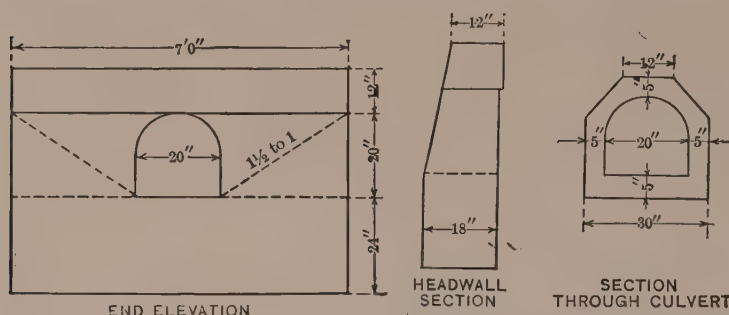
Concrete Arch Culvert. Massachusetts Highway Commission.
